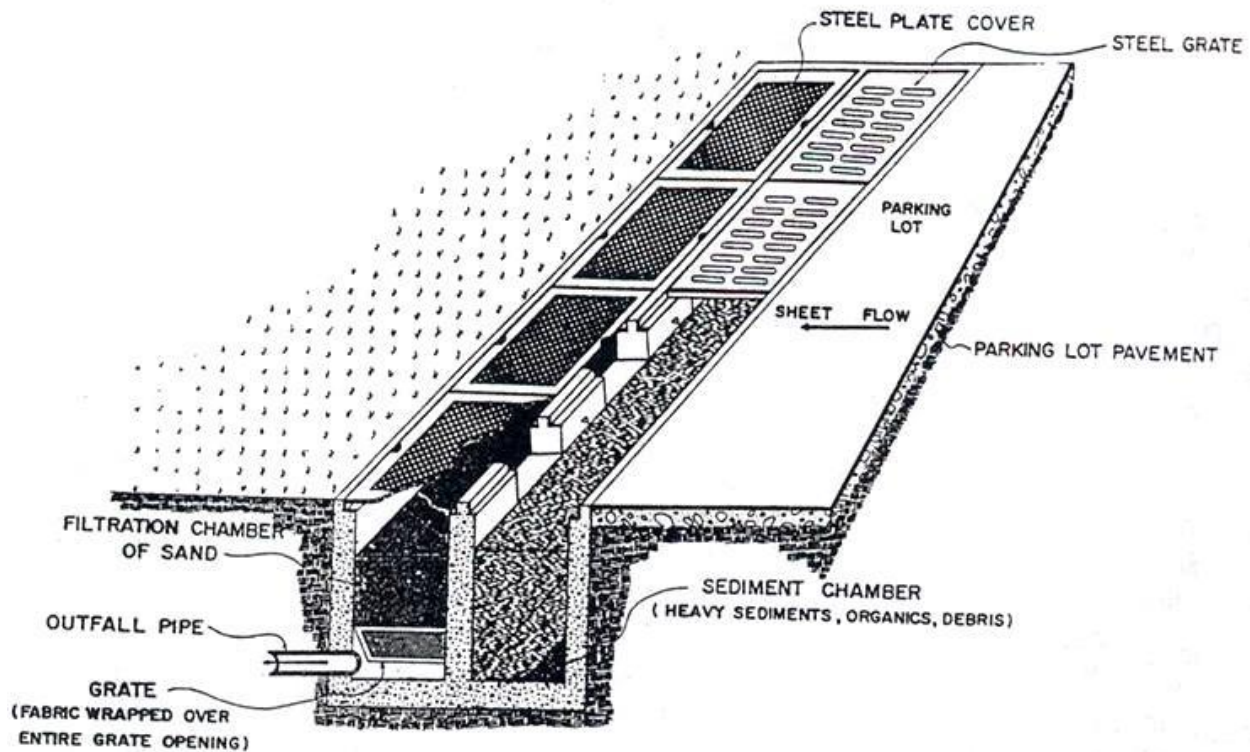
A typical perimeter sand filter placed at the perimeter of a parking lot (MPCA 2023).
